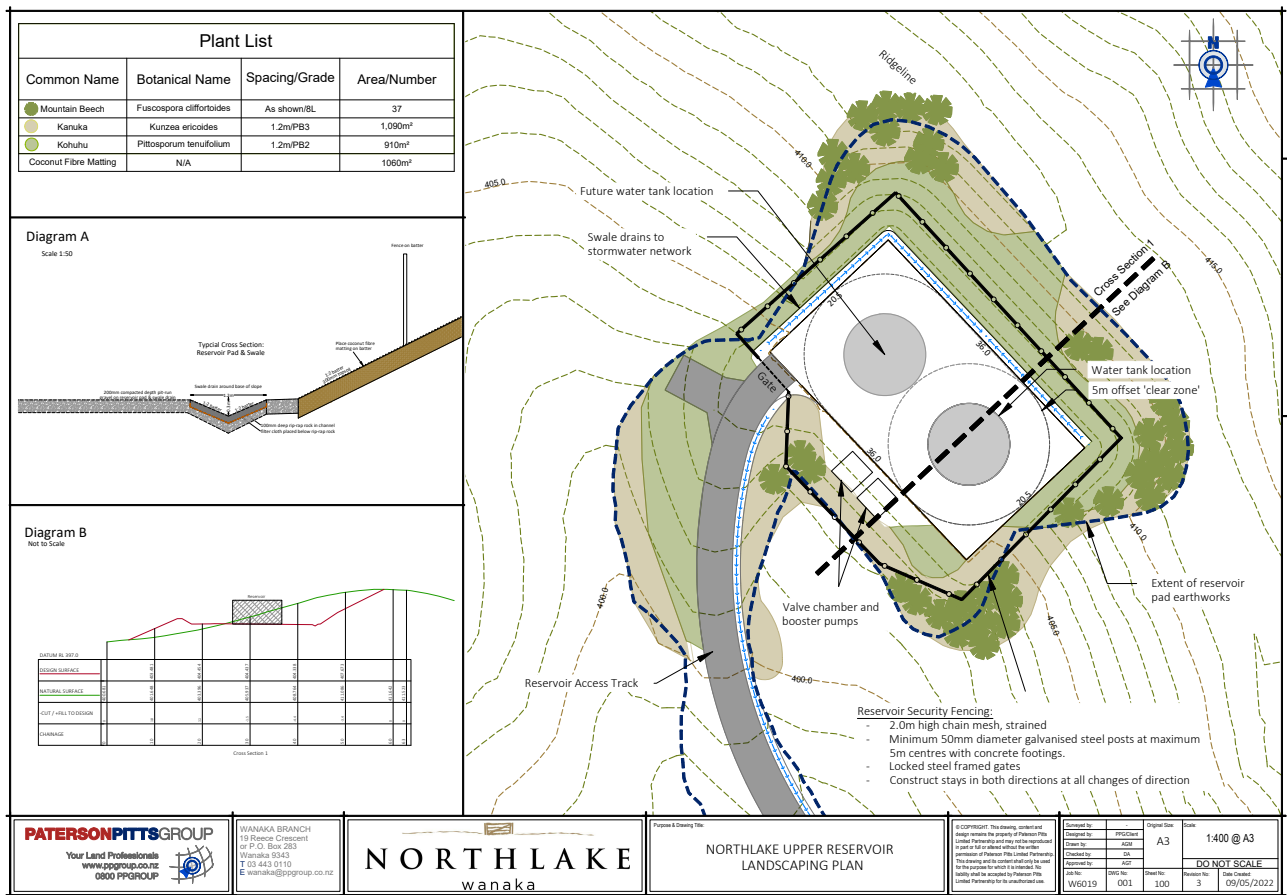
Mitigation landscaping plan for water reservoir above the plan change area.
